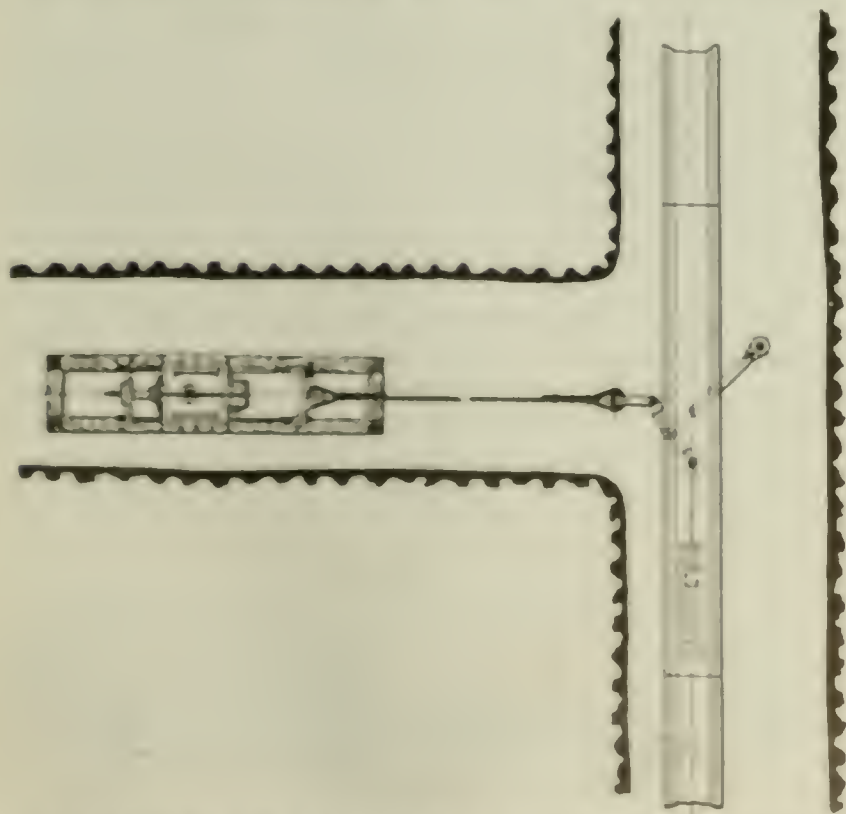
PLAN OF ENGINE AND TROUGH CONNECTIONS.
